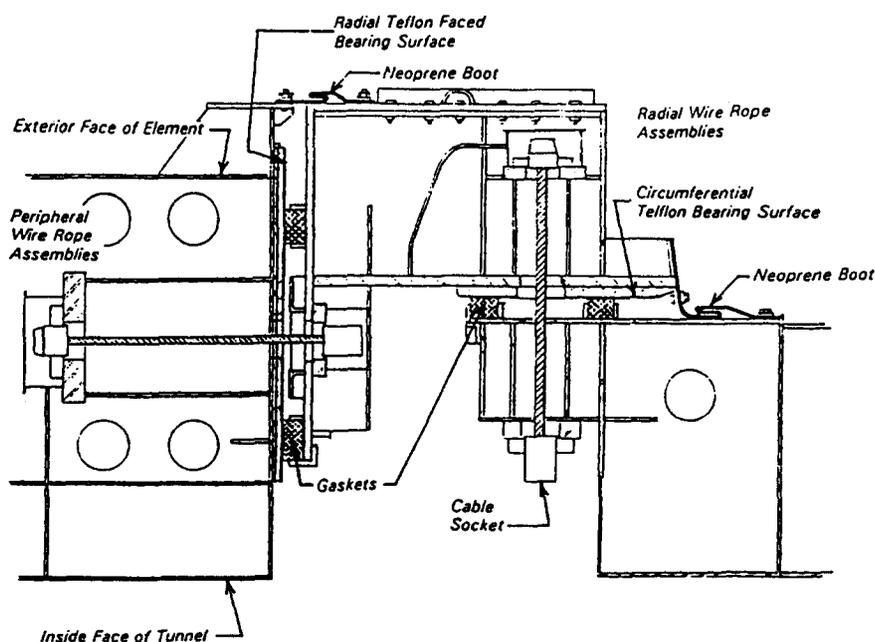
Patented seismic joint used for the Transbay Tunnel, San Francisco.
